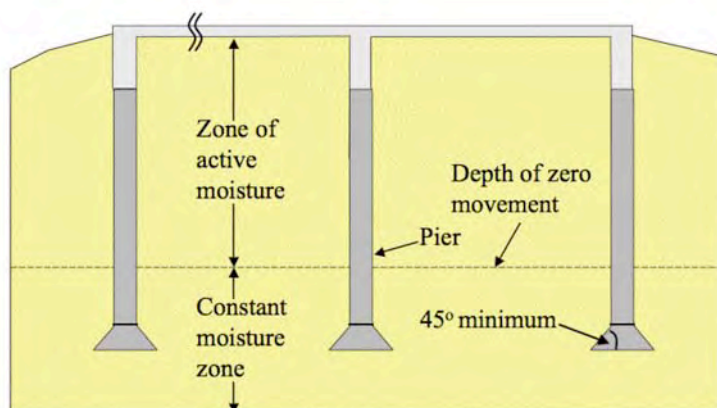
Drilled and Underreamed Concrete Piers
